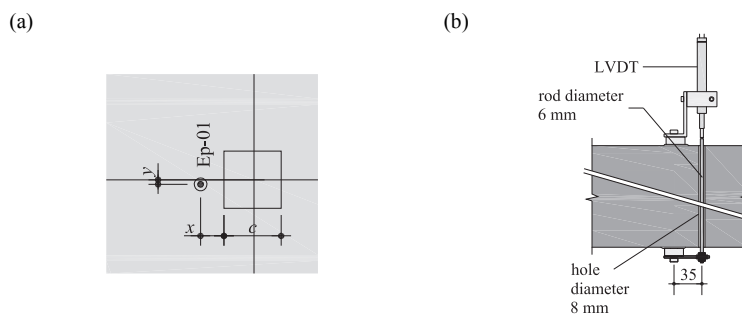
Measurement of change in slab thickness: (a) location in plan view and (b) detail of the measurement installation (dimensions in mm)
